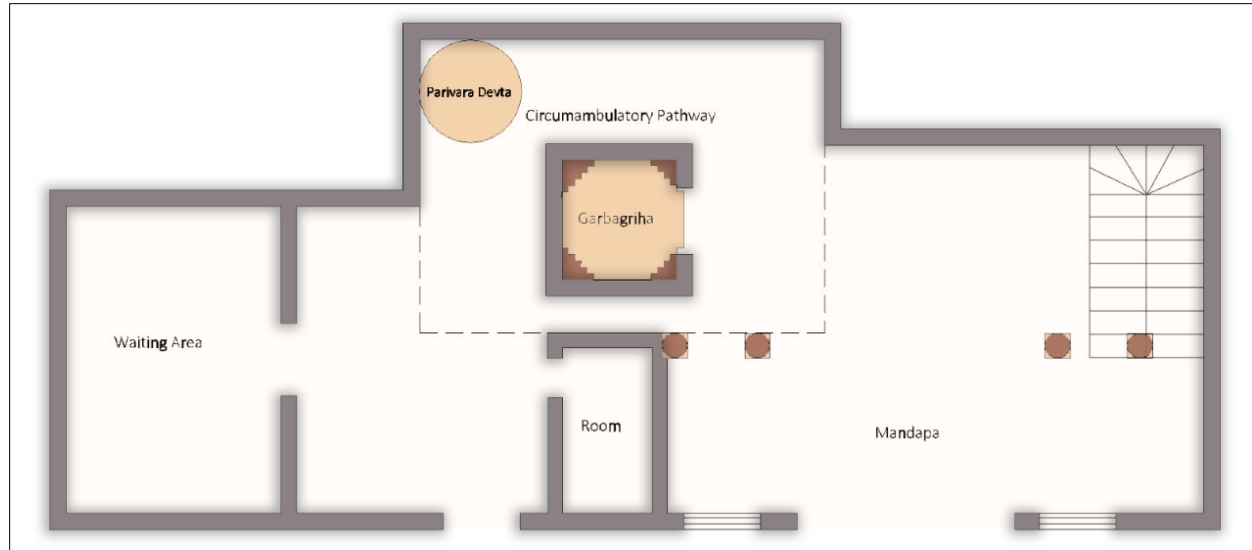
Floor Plan of Bhalla Temple, Chakwal
